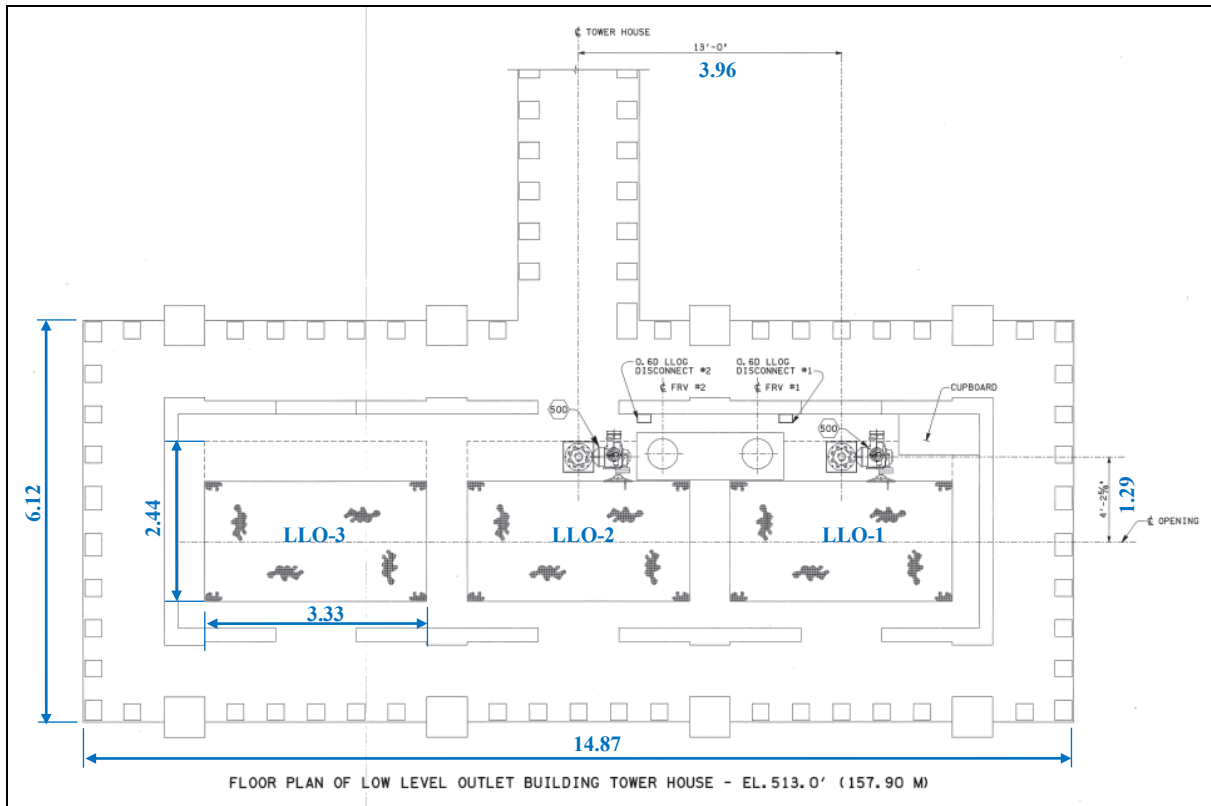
Plan View of the Sluice Tower (metric dimensions scaled from drawing).
